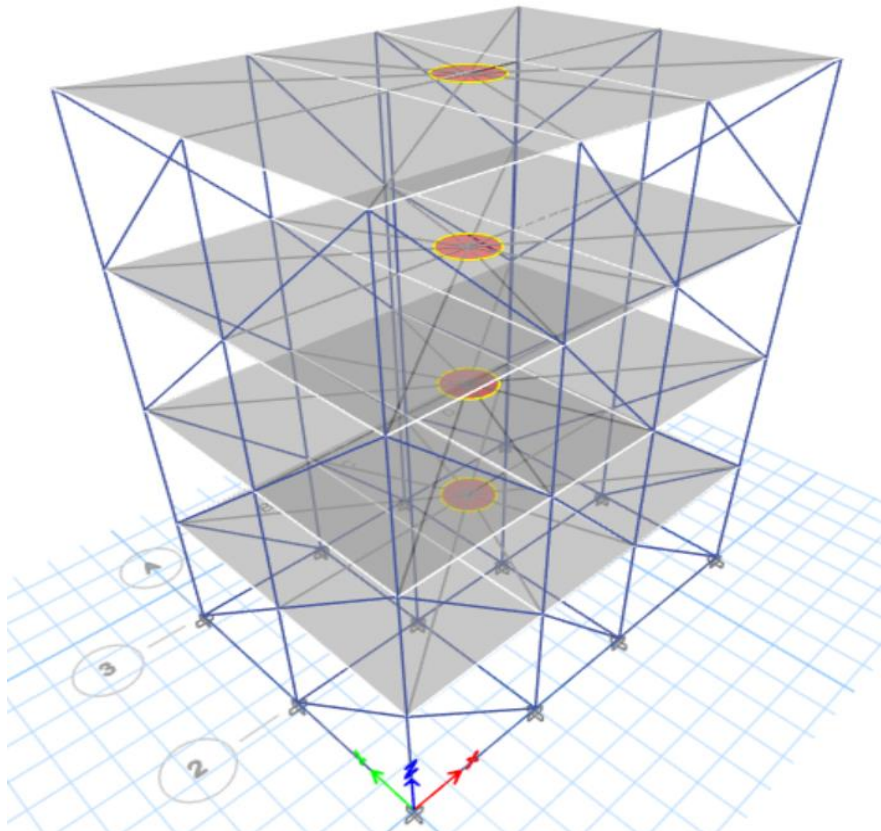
3D view of CMS with wall modeled as a single diagonal strut
